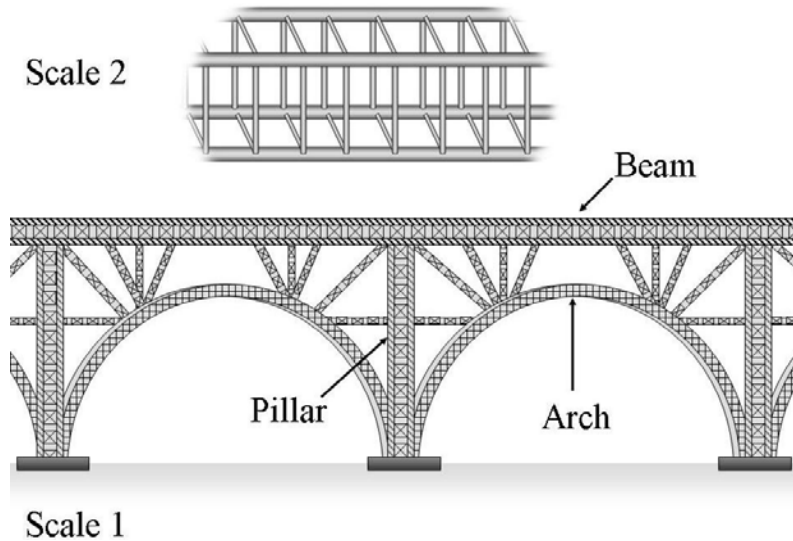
Bridge design applying the principle of structural hierarchy for bridge reinforcement.
